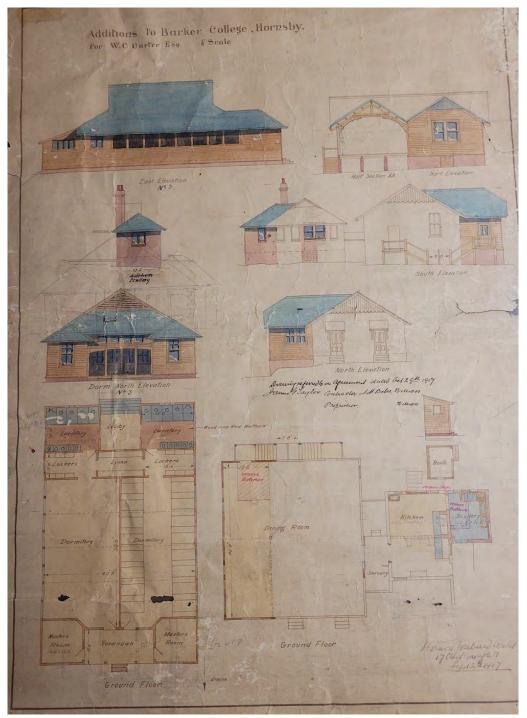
Plan for 'Additions to Baker College', signed by Howard Joseland, architect, 12 September 1917. Plans for the dormitory building (on left) were not carried out as shown, however, the alterations proposed for the dining room and kitchen went ahead. (Source: Barker College Archives, Plan M0003).
